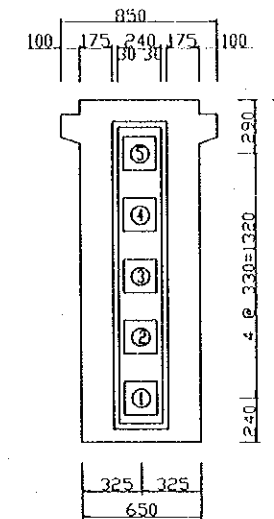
# DETAIL OF SUPERSTRUCTURE FOR TRA ON BIDGE (Ls=33.2M)
